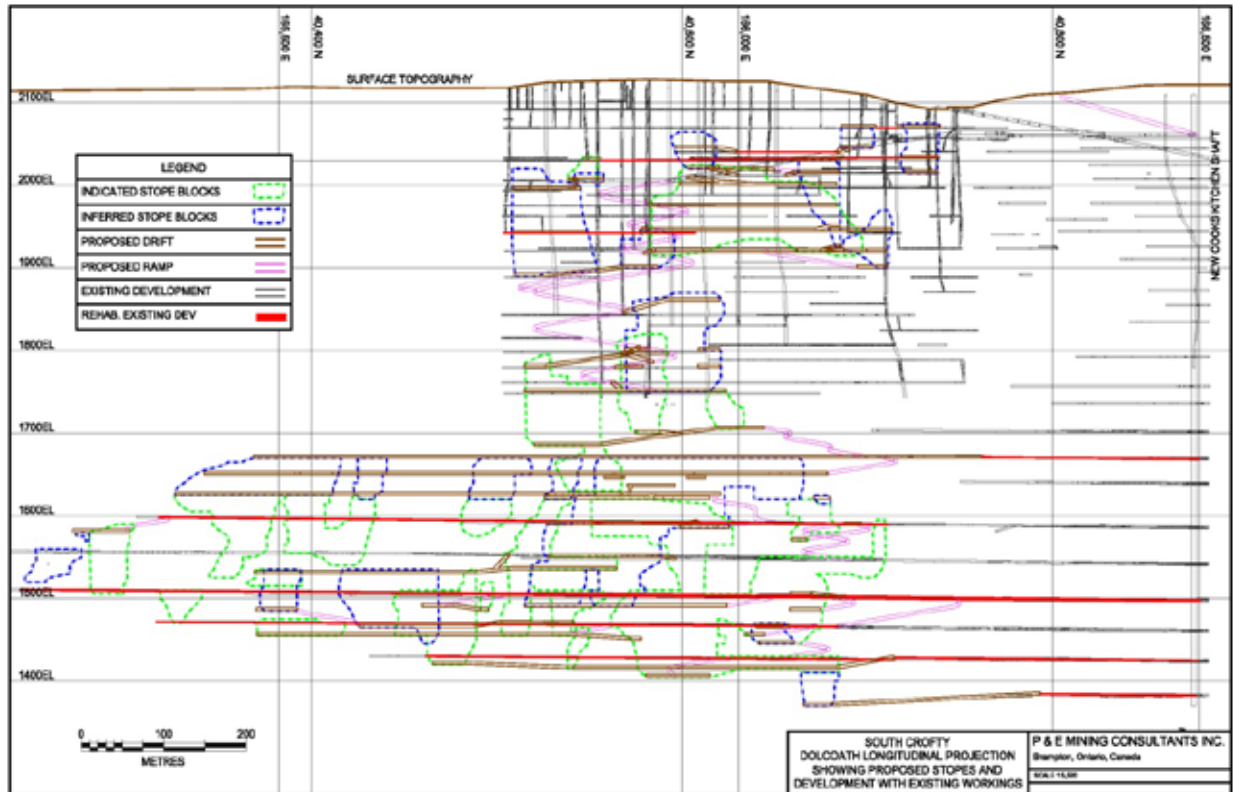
Longitudinal View of the Dolcoath Mine Section Underground Layout
